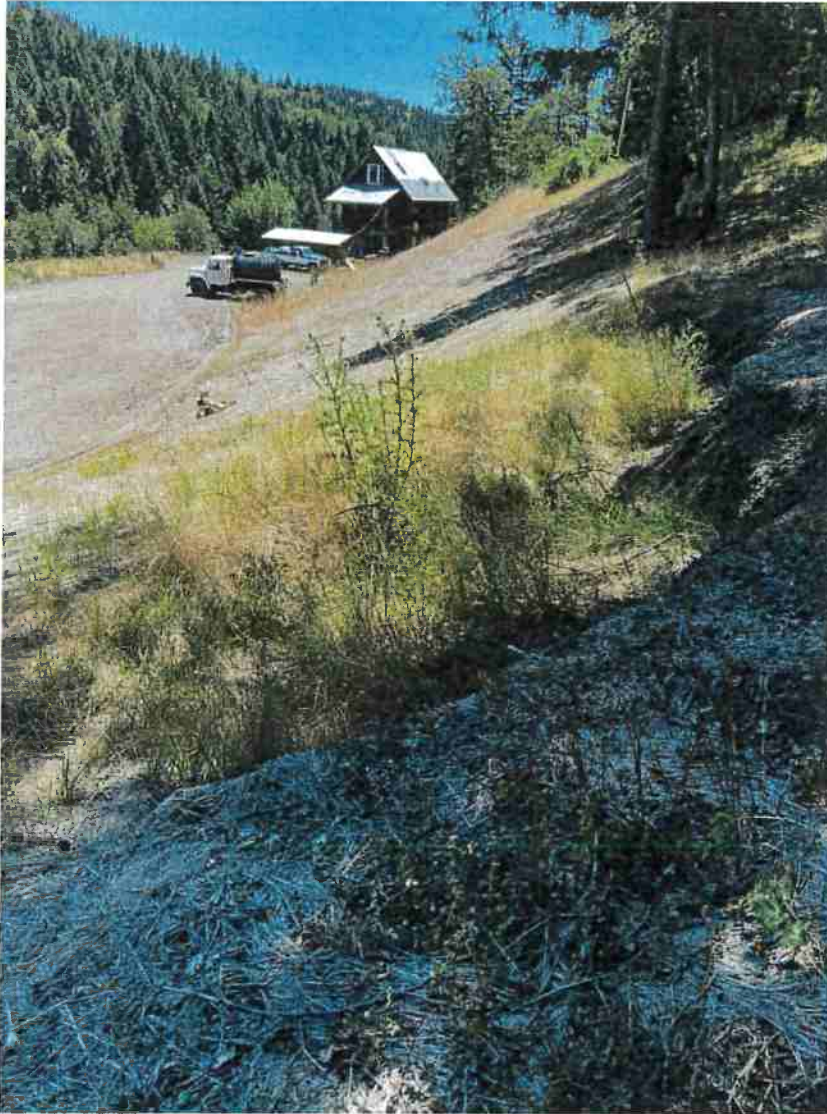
Observation Point 2(a) - Cutbank failure above graded flat.
